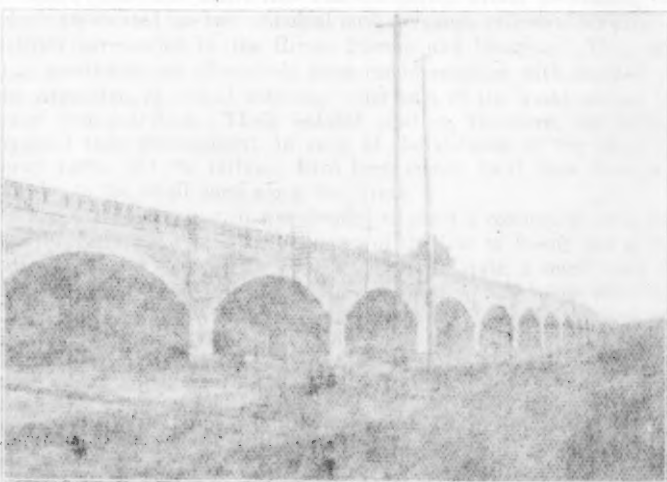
VICTORIA RAILWAY, LOOKING NORTH ALONG THE BRIDGE.
